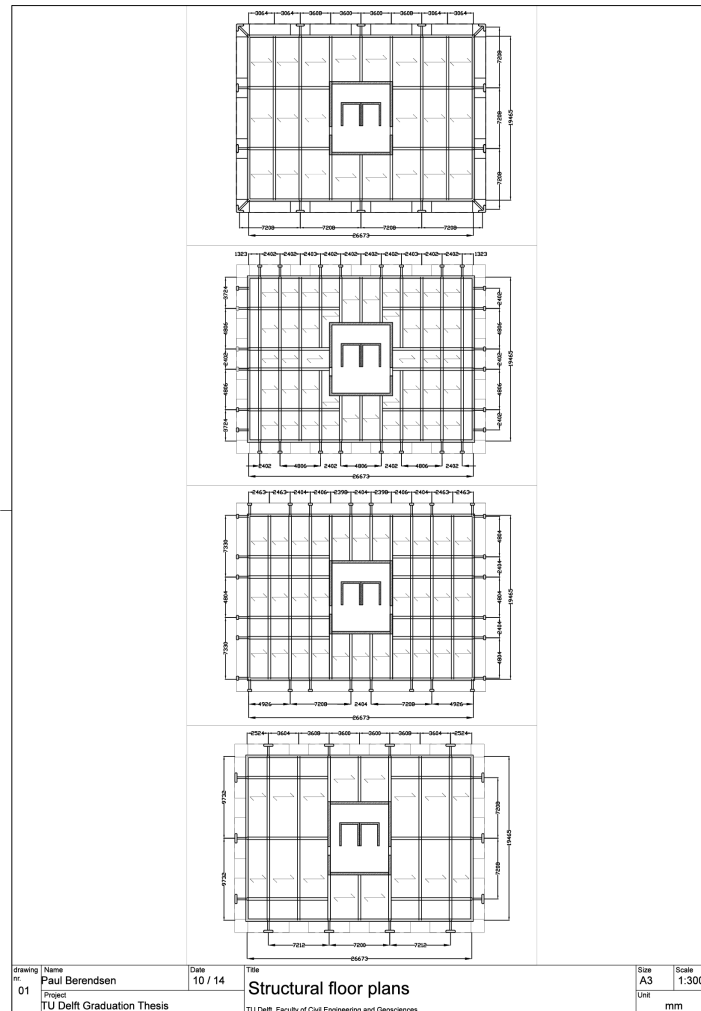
Technical floor plans steel structure, full size drawing can be found in Appendix I
